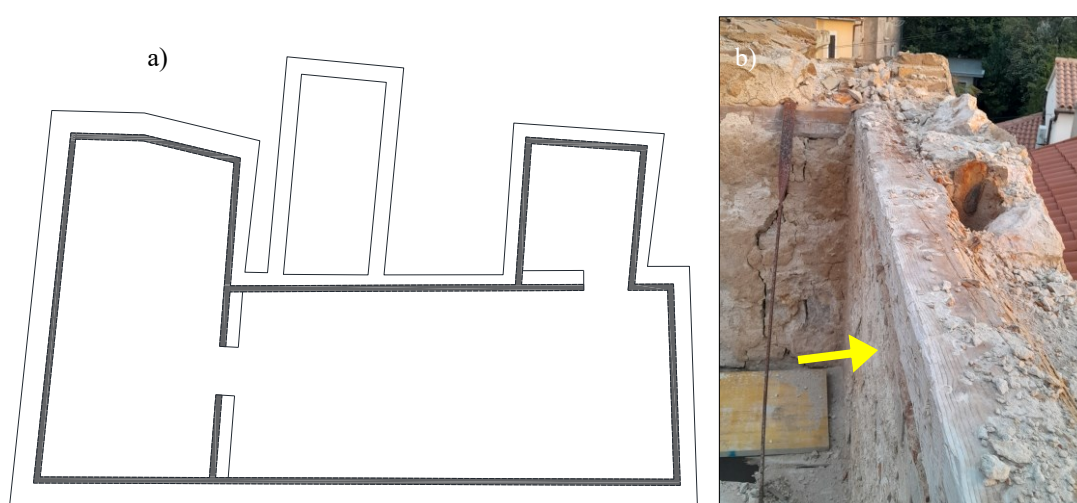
Timber ring beams at the roof level: a) Ground plan; b) Detail.
